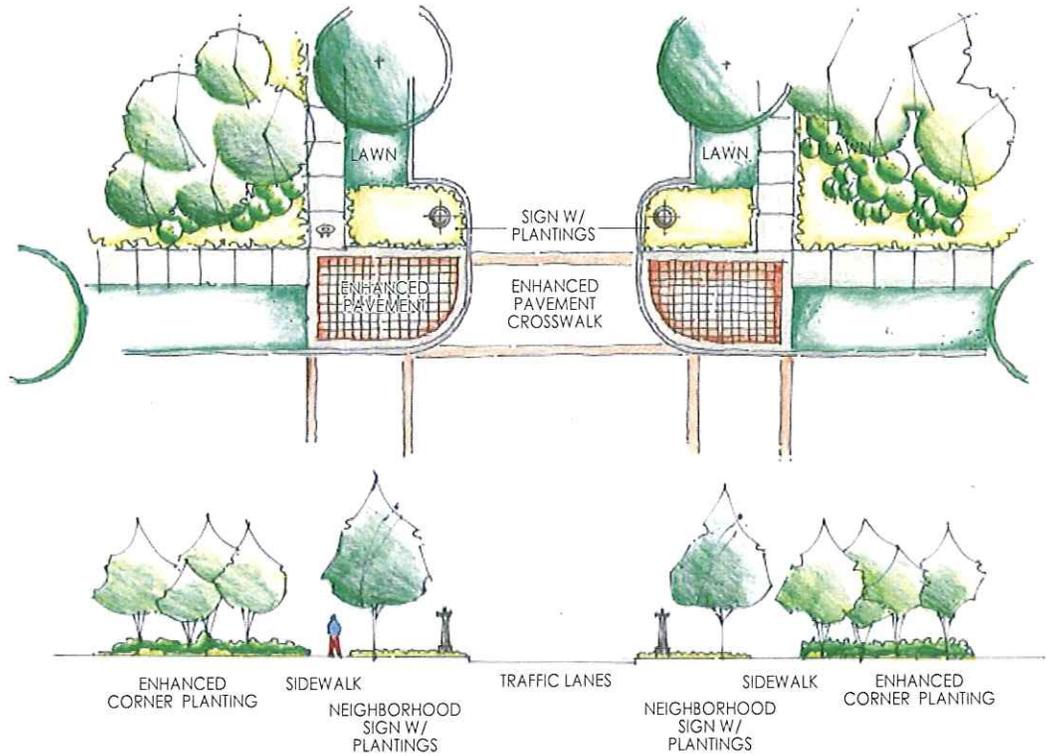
Conceptual Plan and Elevation of Neighborhood Entry Signage Options
